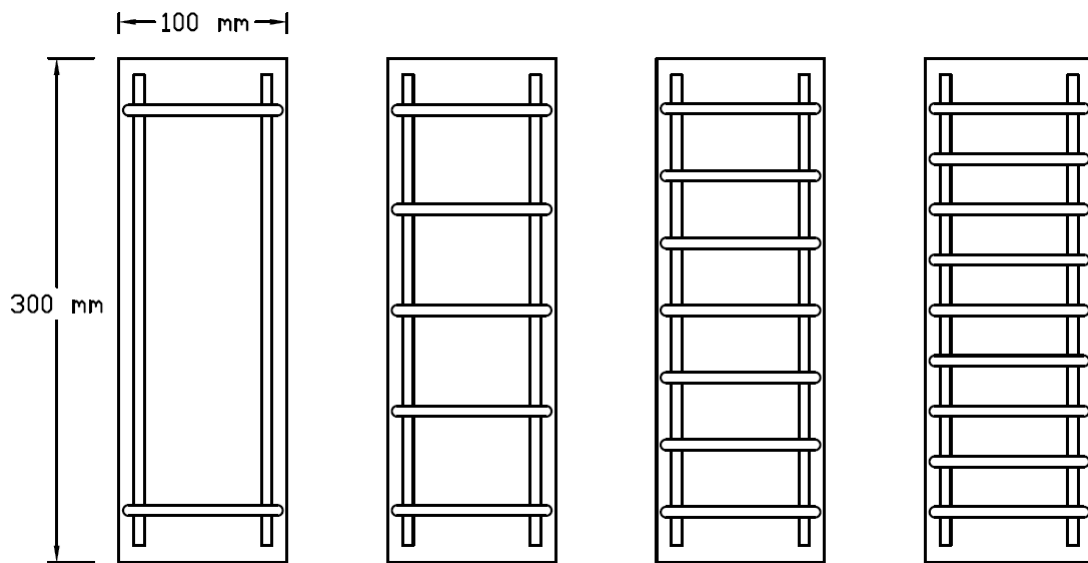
cross-sectional details of specimens with 0%, 1%, 1.5%, and 2% transverse steel content
